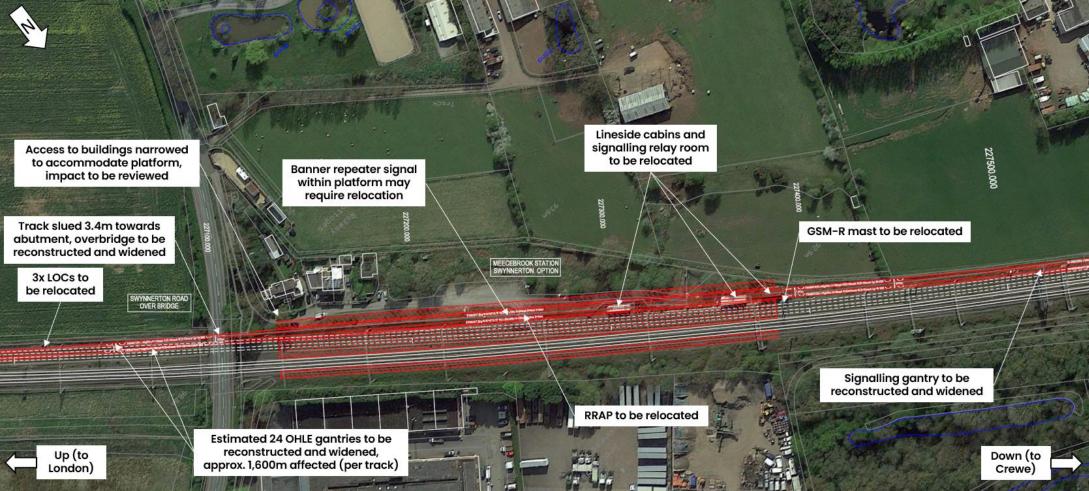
Swynnerton Option impact assessment (see Section 5 and Appendix A for detail)
